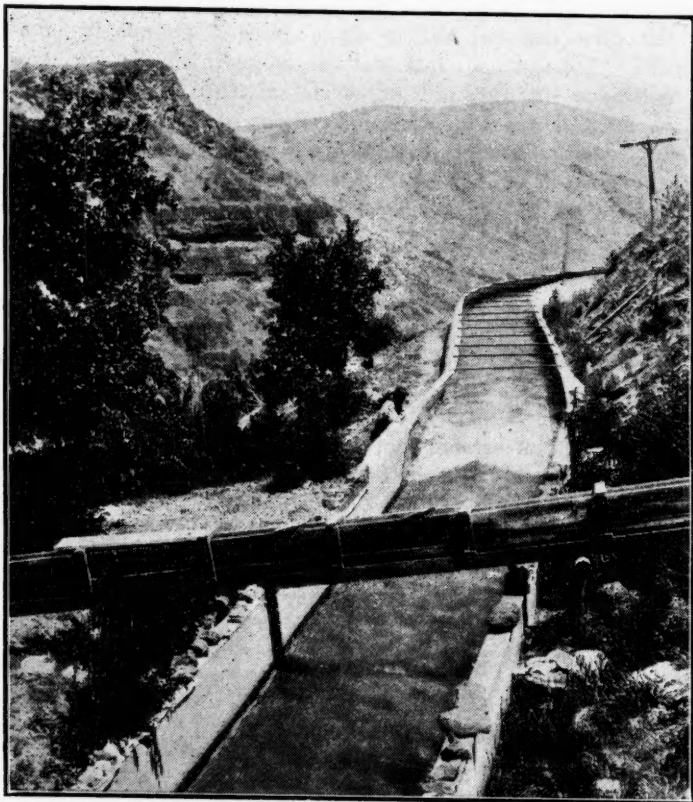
VIEW OF OUTLET, COLUMNAR TUNNEL.
